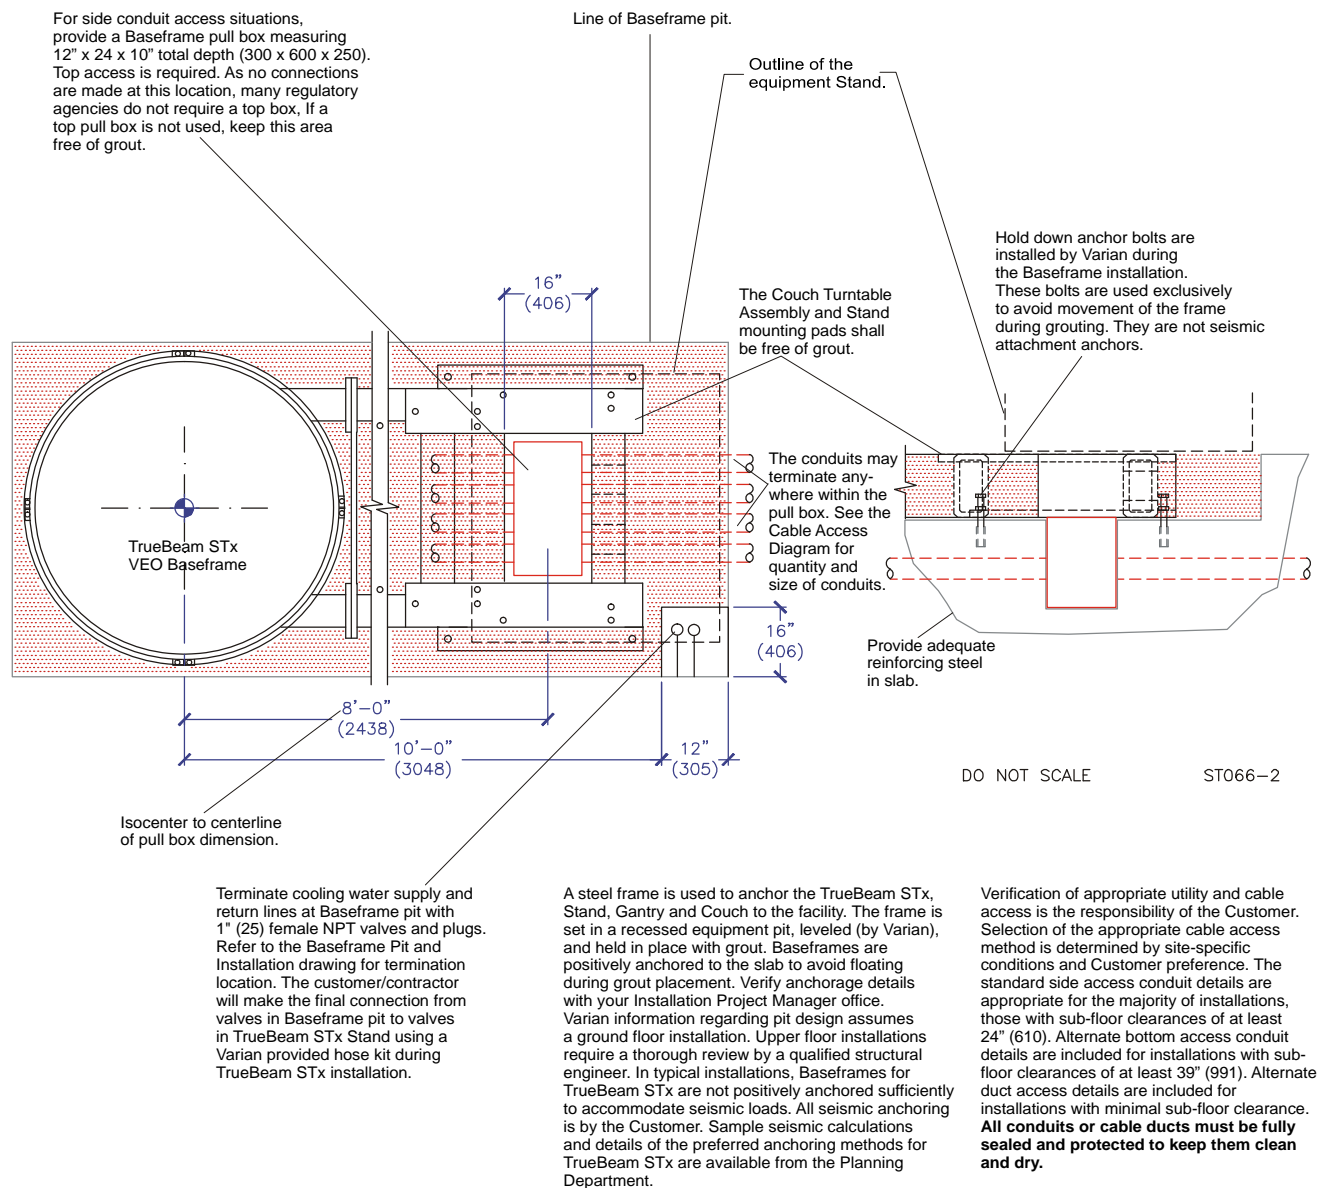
Standard Side Cable Access Plan and Section at Pull Box
